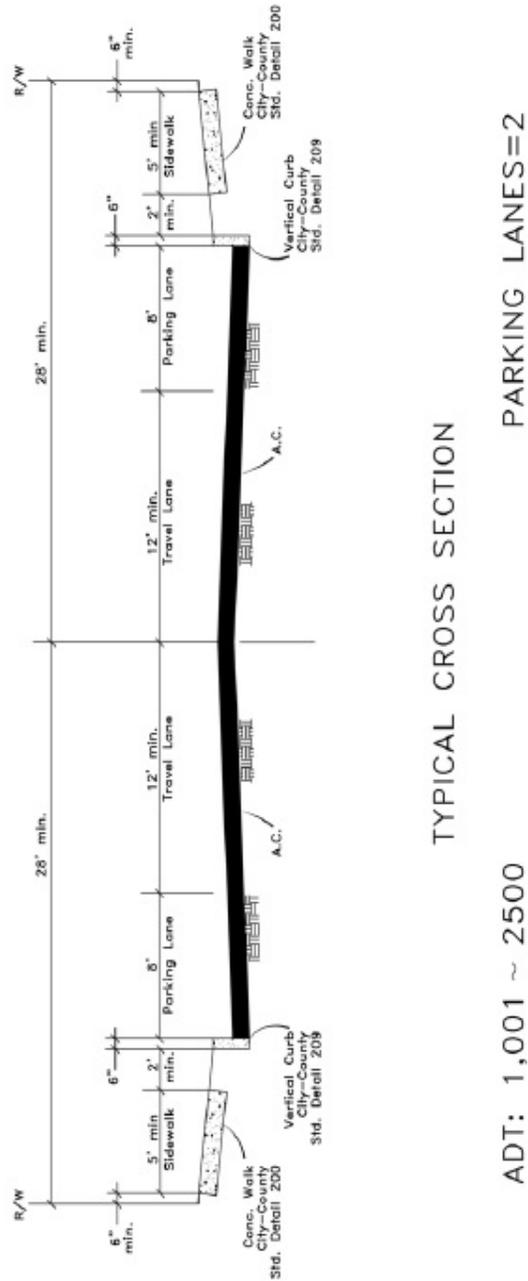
Typical Cross Section - Two Parking Lanes (ADT 1,000 - 2,500)
